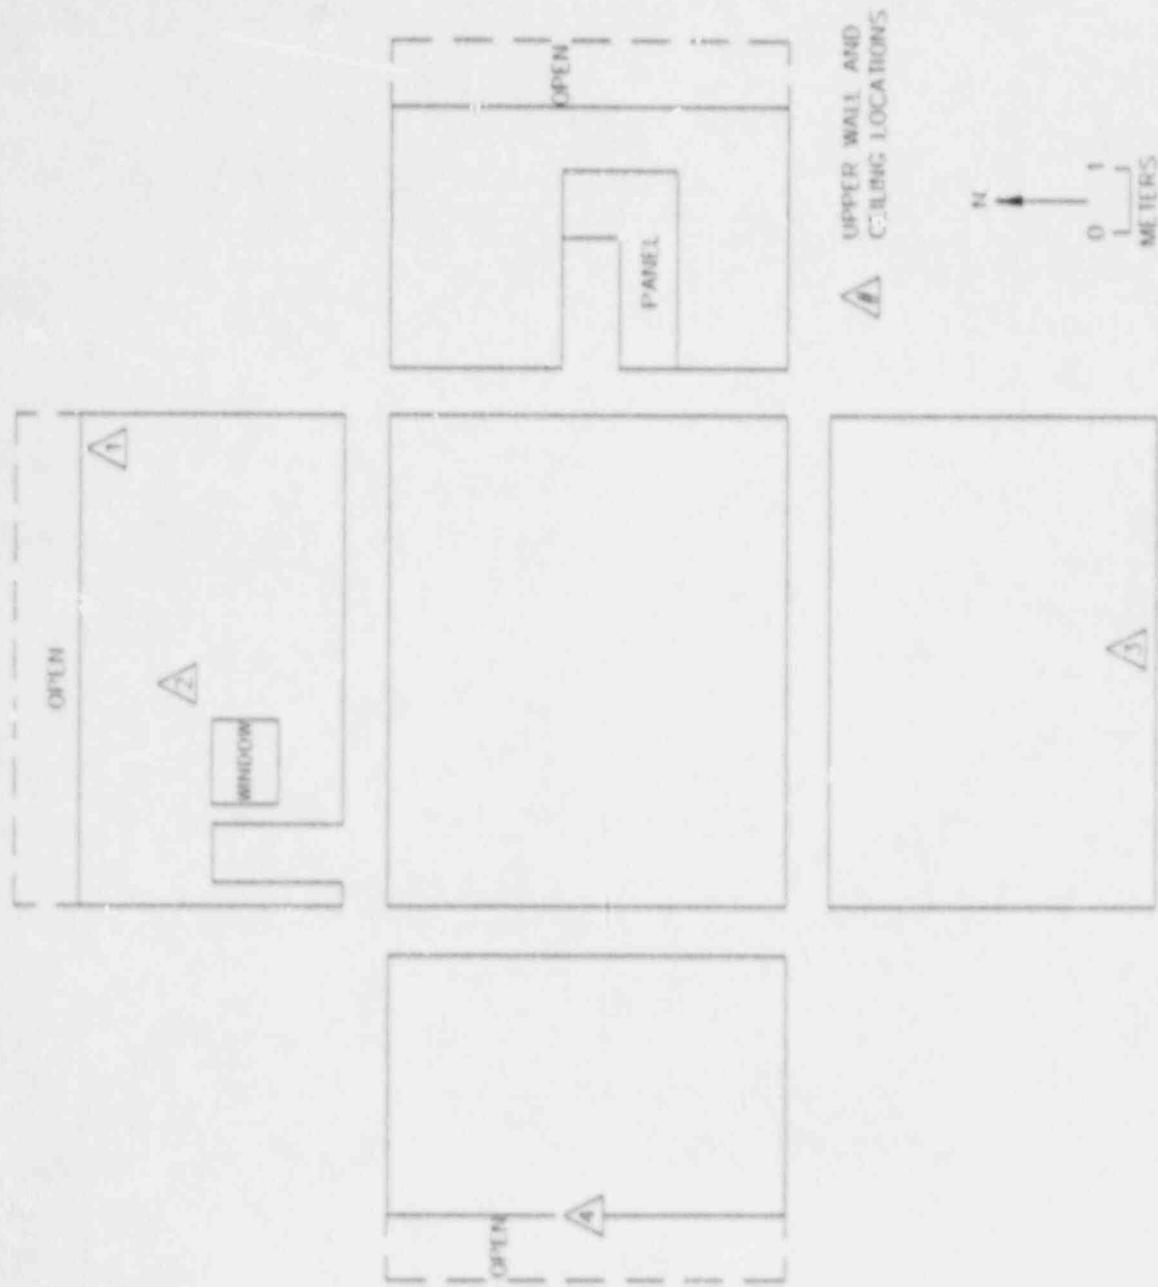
Room 16 Showing Locations of Upper Wall and Ceiling Single-point Measurements
